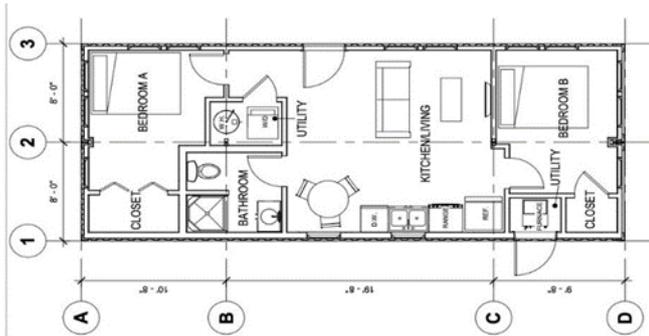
Typical Floor plan of a Single room Shipping Container
